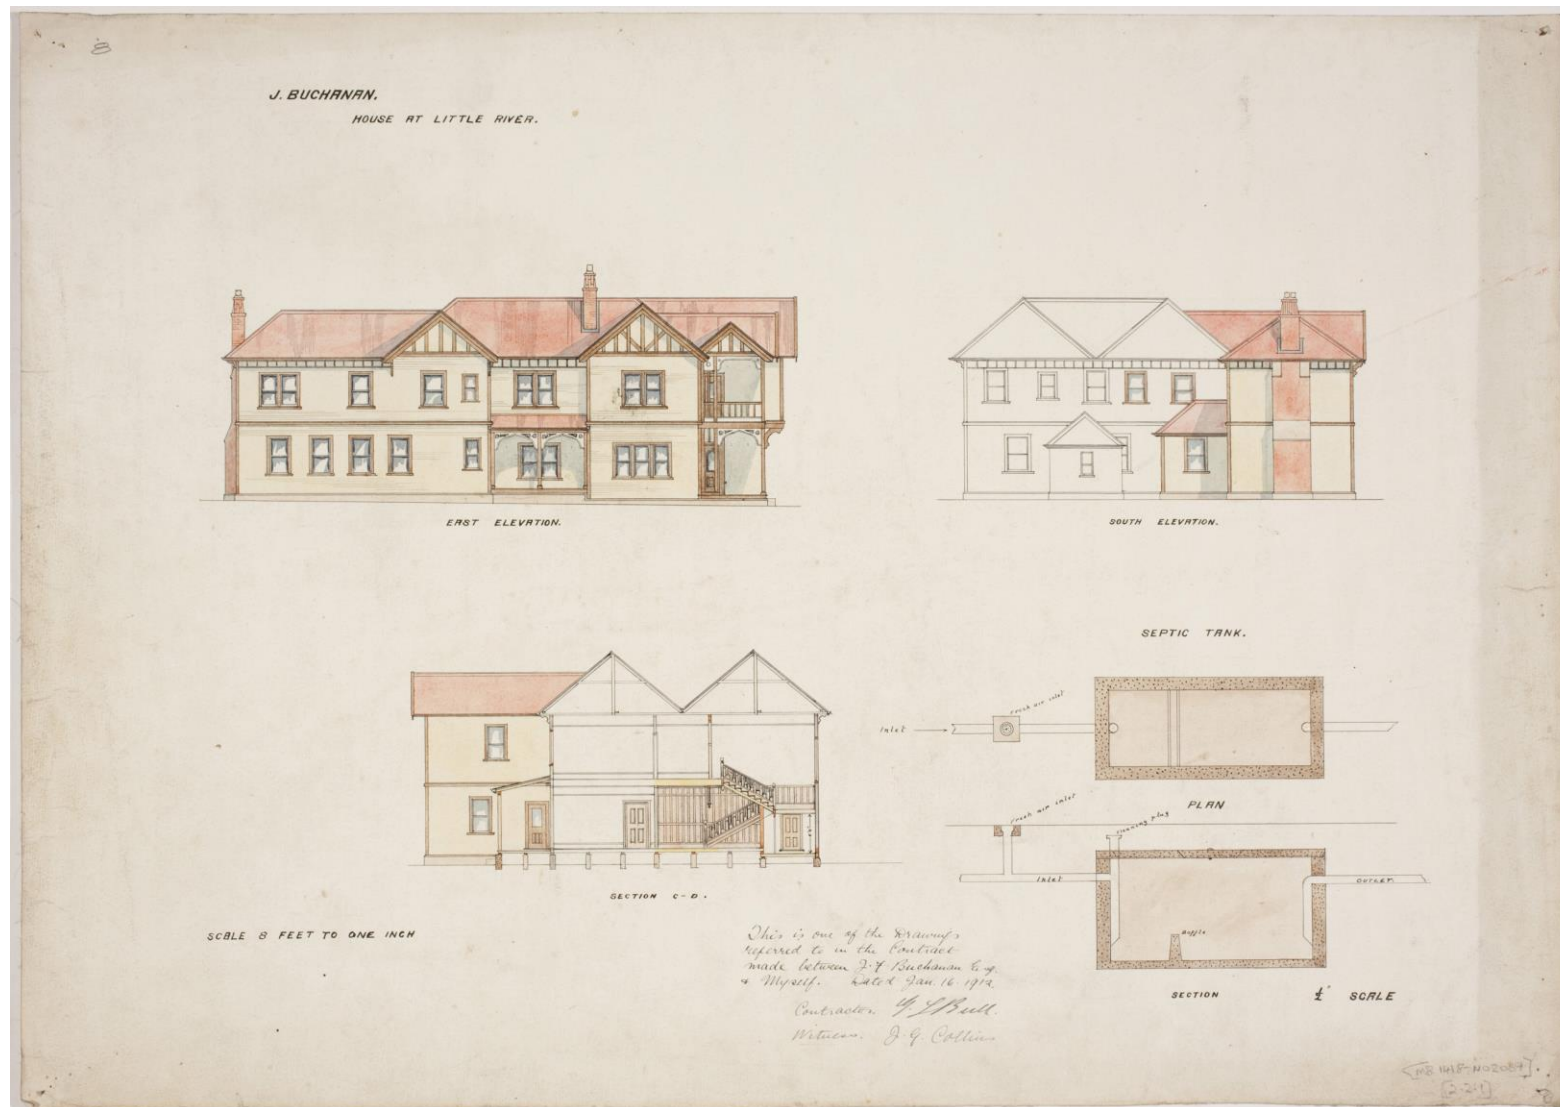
Collins and Harman, J. Buchanan, Esq., House at Little River, elevations, section and details (1912).
